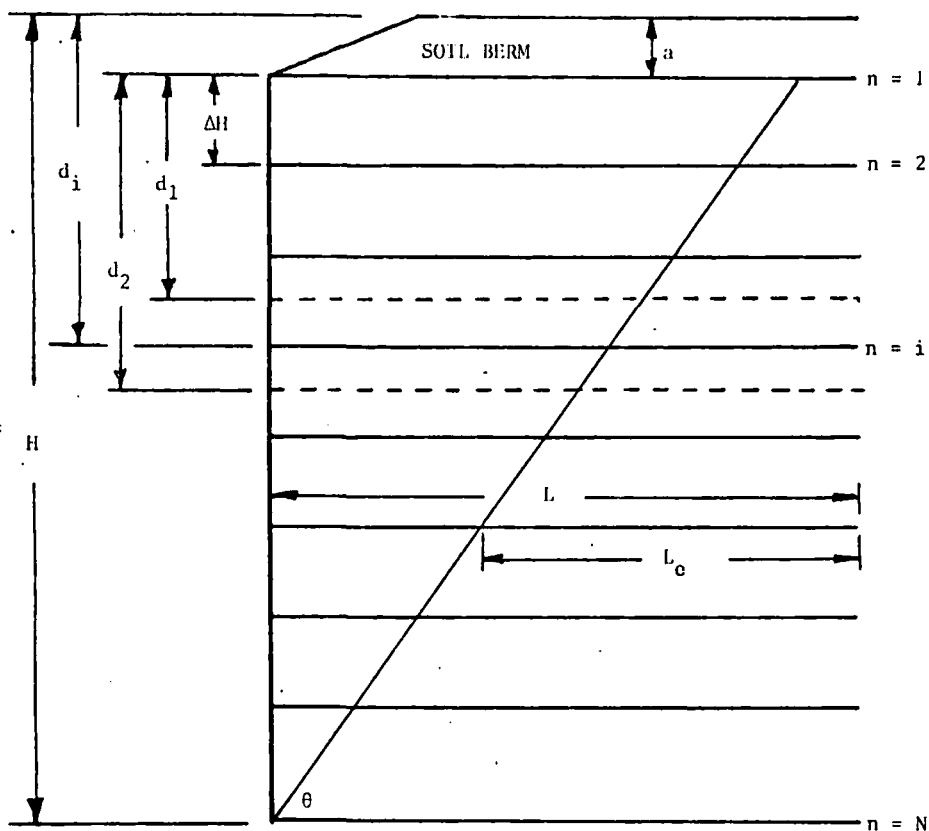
Common Notation for Reinforced Soil Walls Utilizing Strip and Sheet Reinforcement
